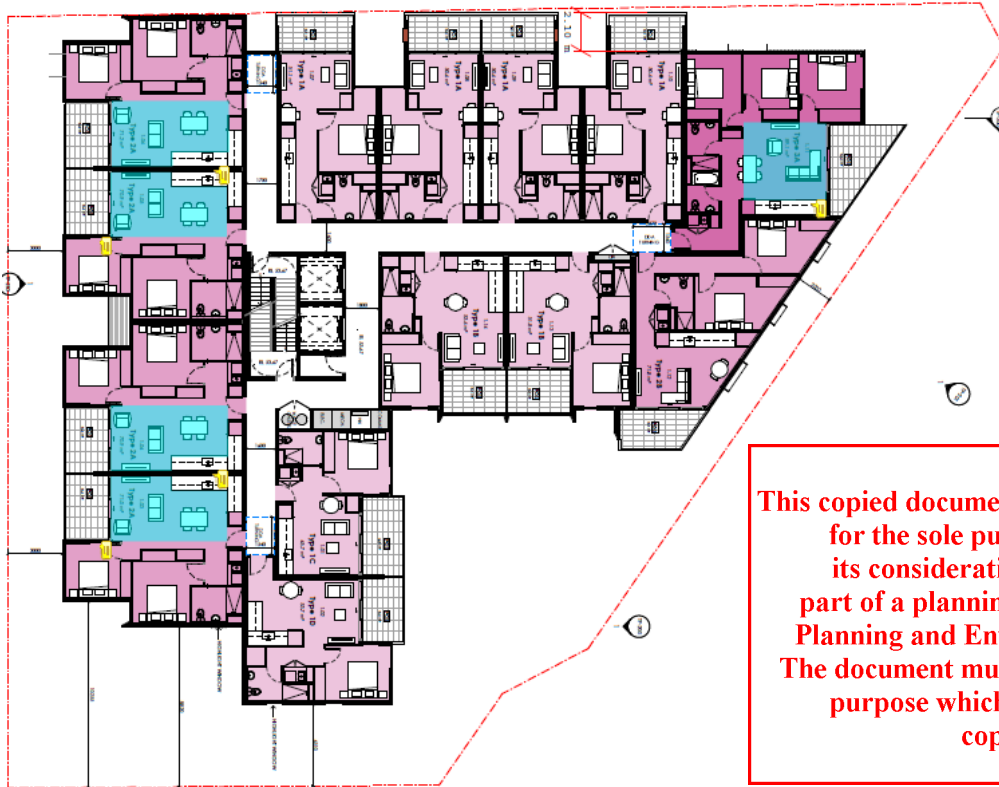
Mark-up of non-DTS rooms (light blue) on the Ground Floor
